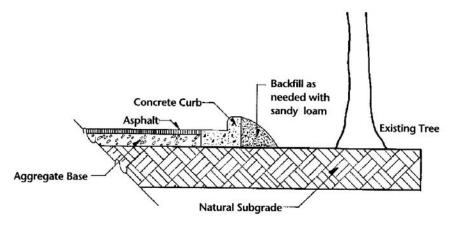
Suggested method of pavement construction within TPZ's of T91.
